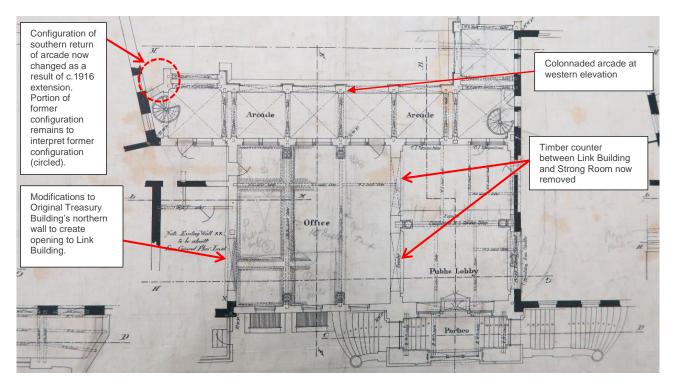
Ground Floor Plan, by Vernon, December 1897
